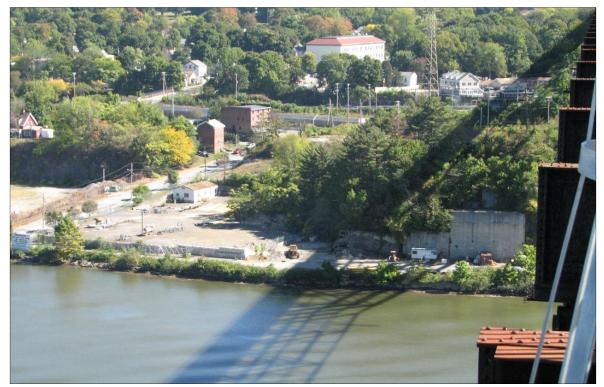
Looking east from Walkway Over the Hudson; sideslope grading and capping will occur adjacent to the shoreline and dredging will occur in the foreground
